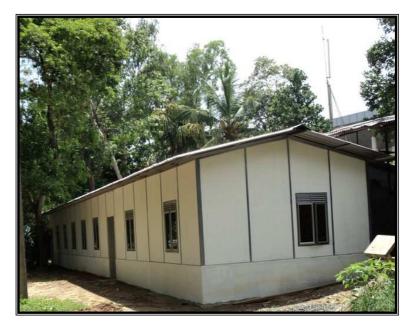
A building constructed with "Dura" panels and steel channels to be used as a site office
